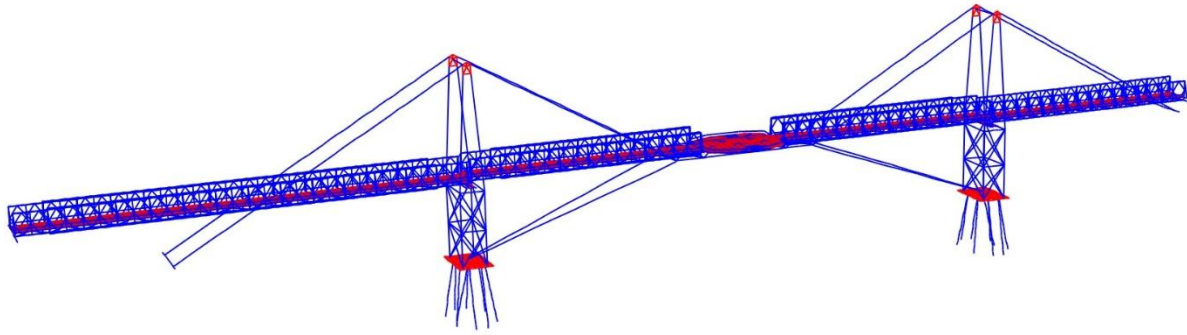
Three-dimensional finite element model of the Tsolum River Bridge developed in CSiBridge, showing the full structural system including truss spans, towers, cables, and midspan cradle.
